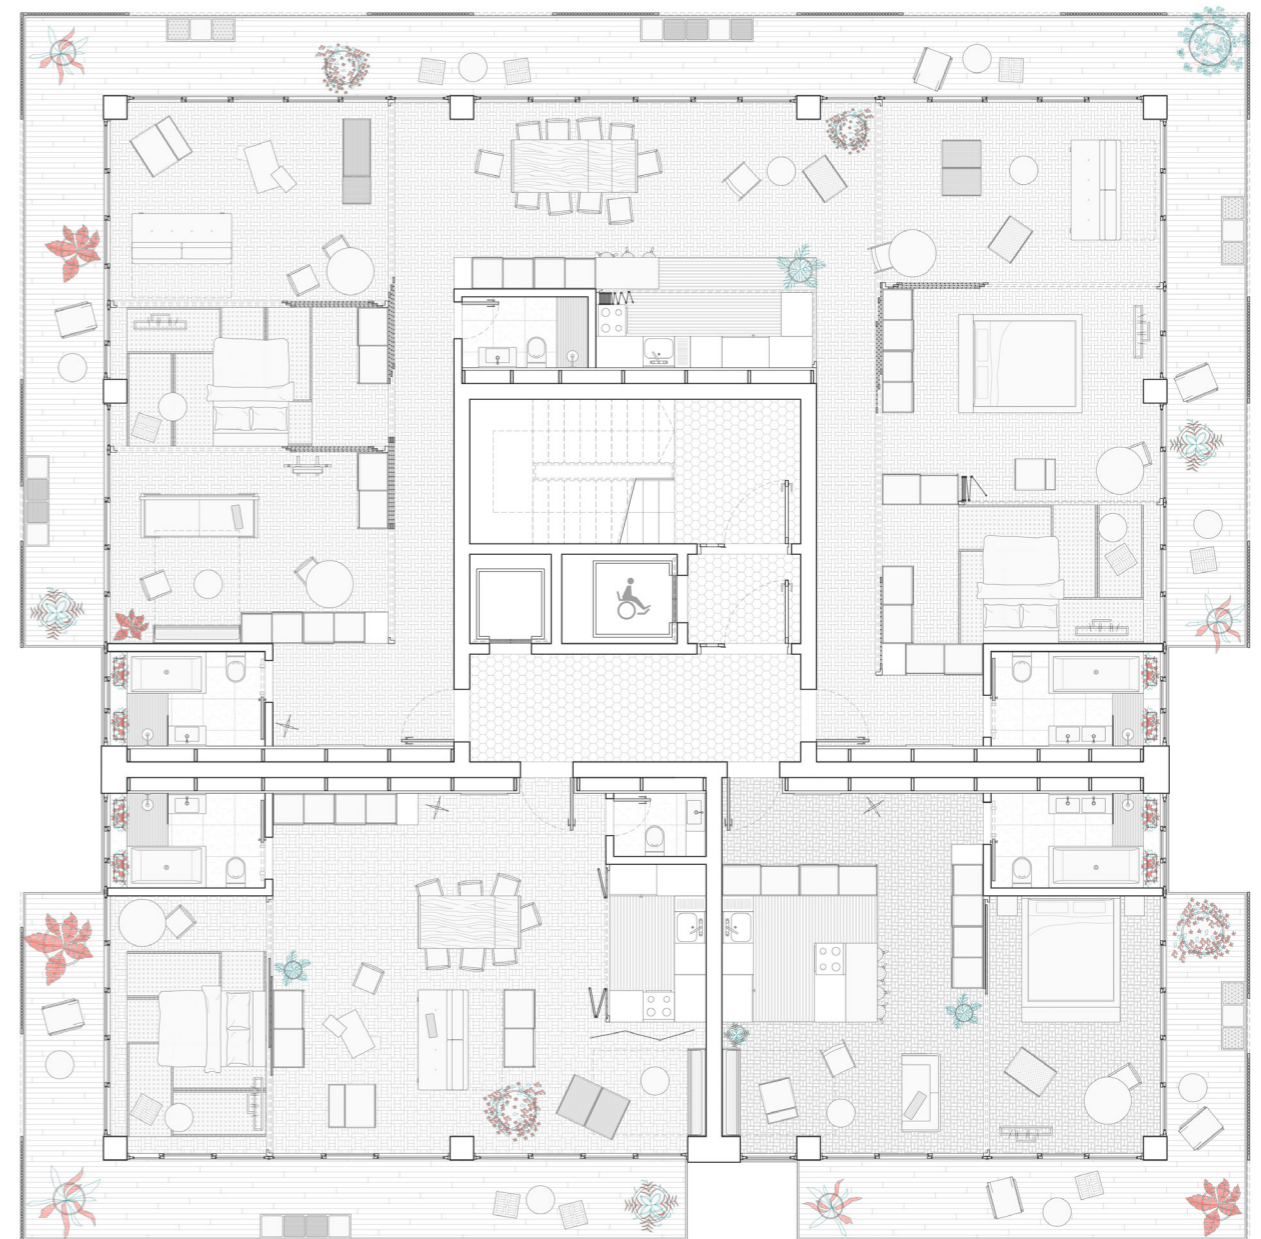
Type 2 - Dwelling Units Floor Plan, variation 1 (levels 7-8)
